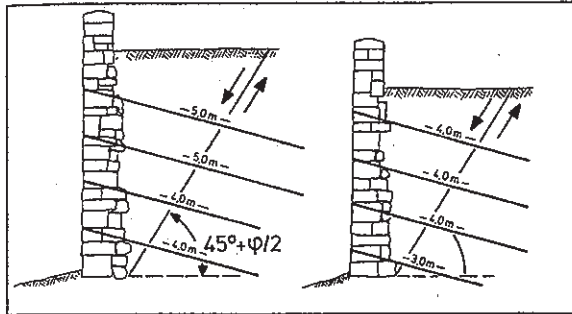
Failure mode for the dimensioning of the nails.
